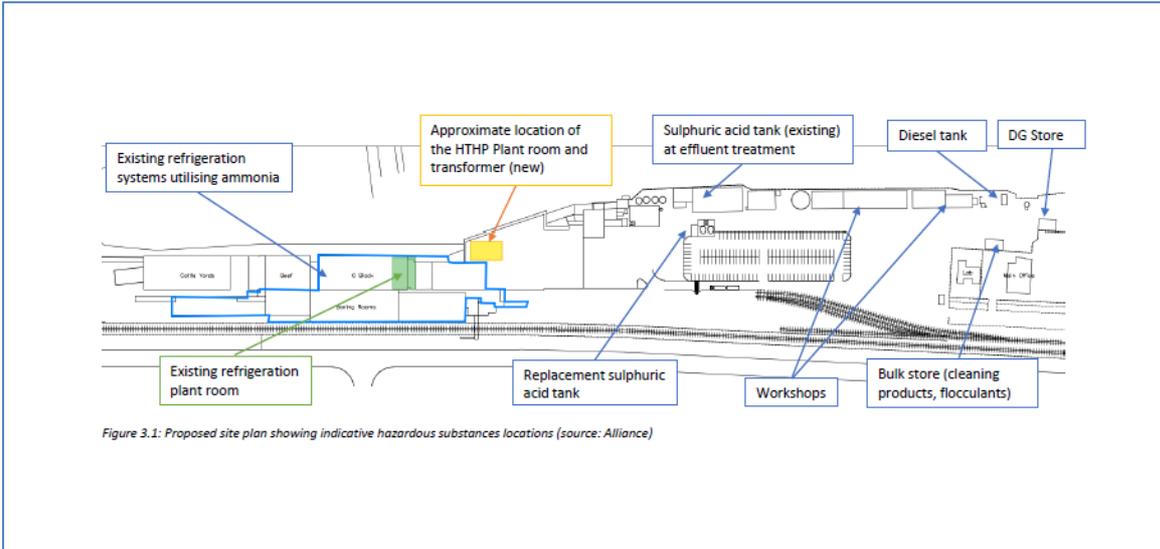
Proposed site plan showing approximate location of proposed HTHP Plant room and hazardous substances locations
